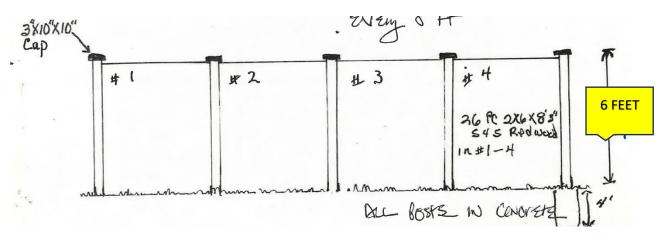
ELEVATION OF PROPOSED FENCE IN FRONT YARD SETBACK
